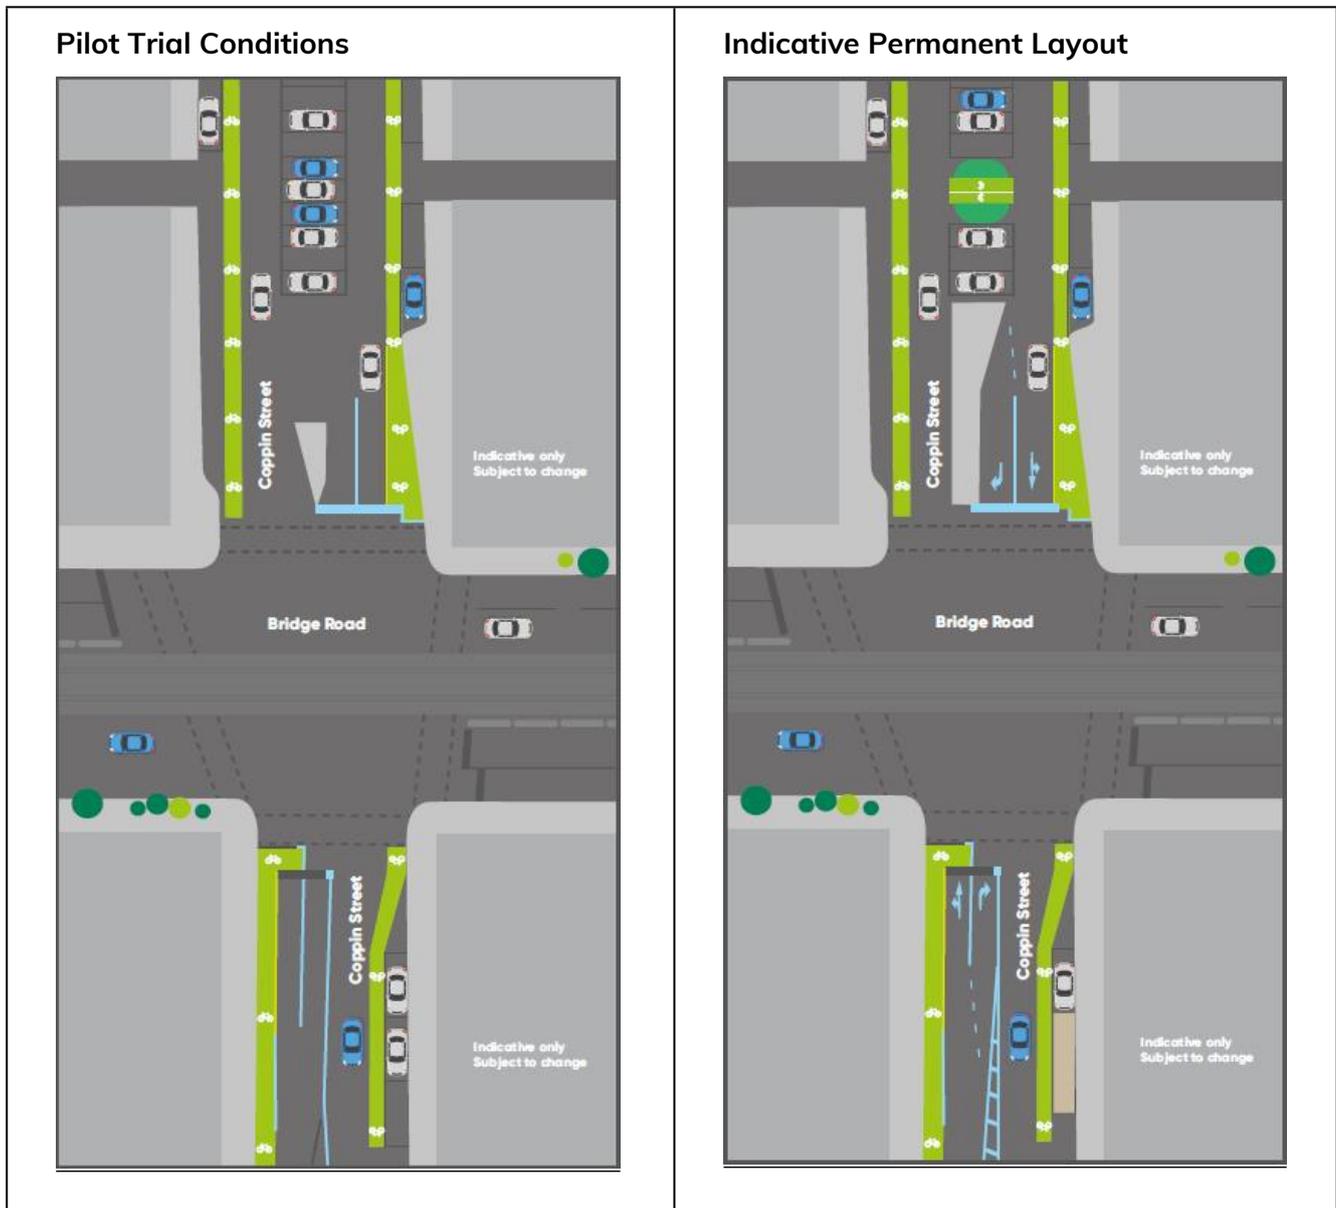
Current pilot trial conditions compared to proposed permanent treatment on Coppin Street at the intersection with Bridge Road.
